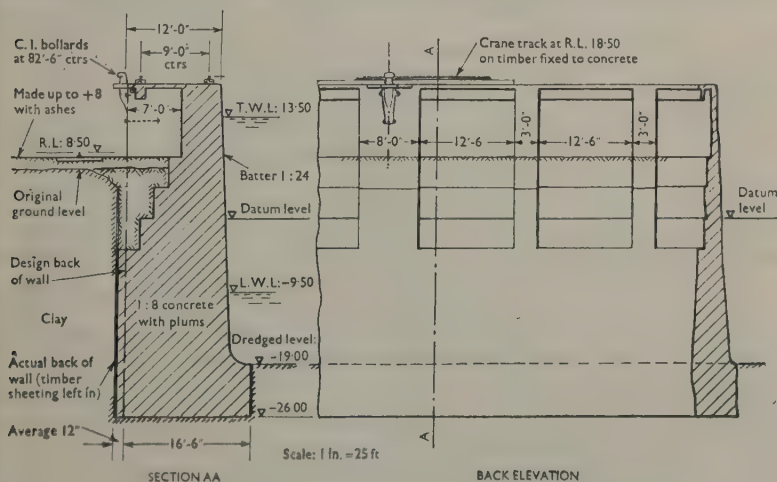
TYPICAL DETAIL OF WEST WALL AS BUILT 1913
